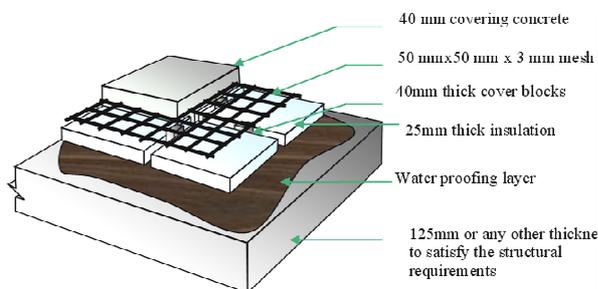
Detailed arrangement of the insulation system proposed over reinforced concrete slabs
